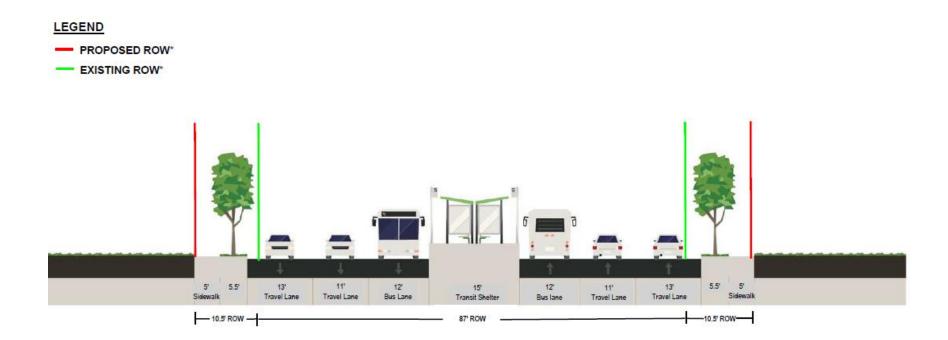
Typical Cross Section of Dedicated Lanes Segment for Alternative B along Holt Boulevard
